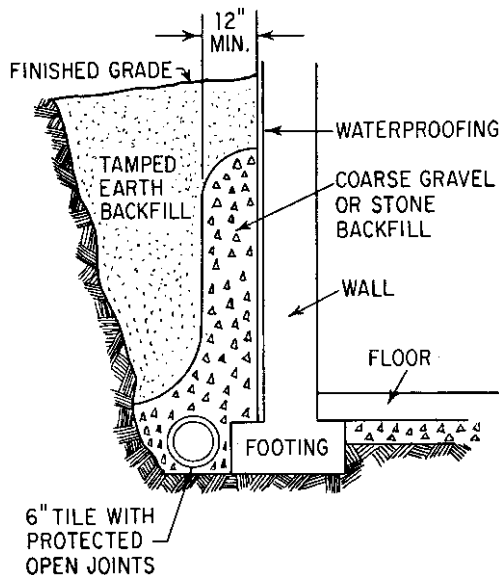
Drainage of basement wall with drain tile along the footing and gravel fill.
